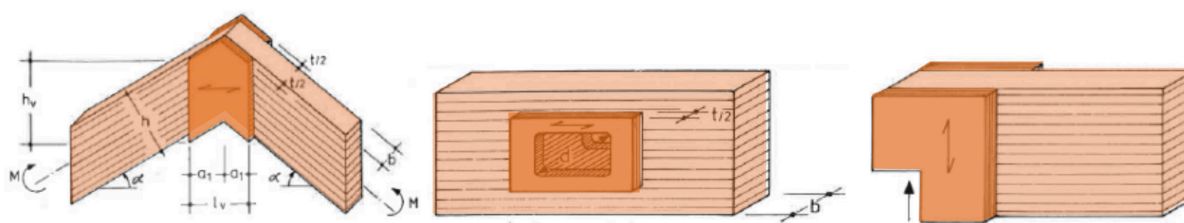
Connection assembled, reinforced end notch or hole (Steck, 1988)
